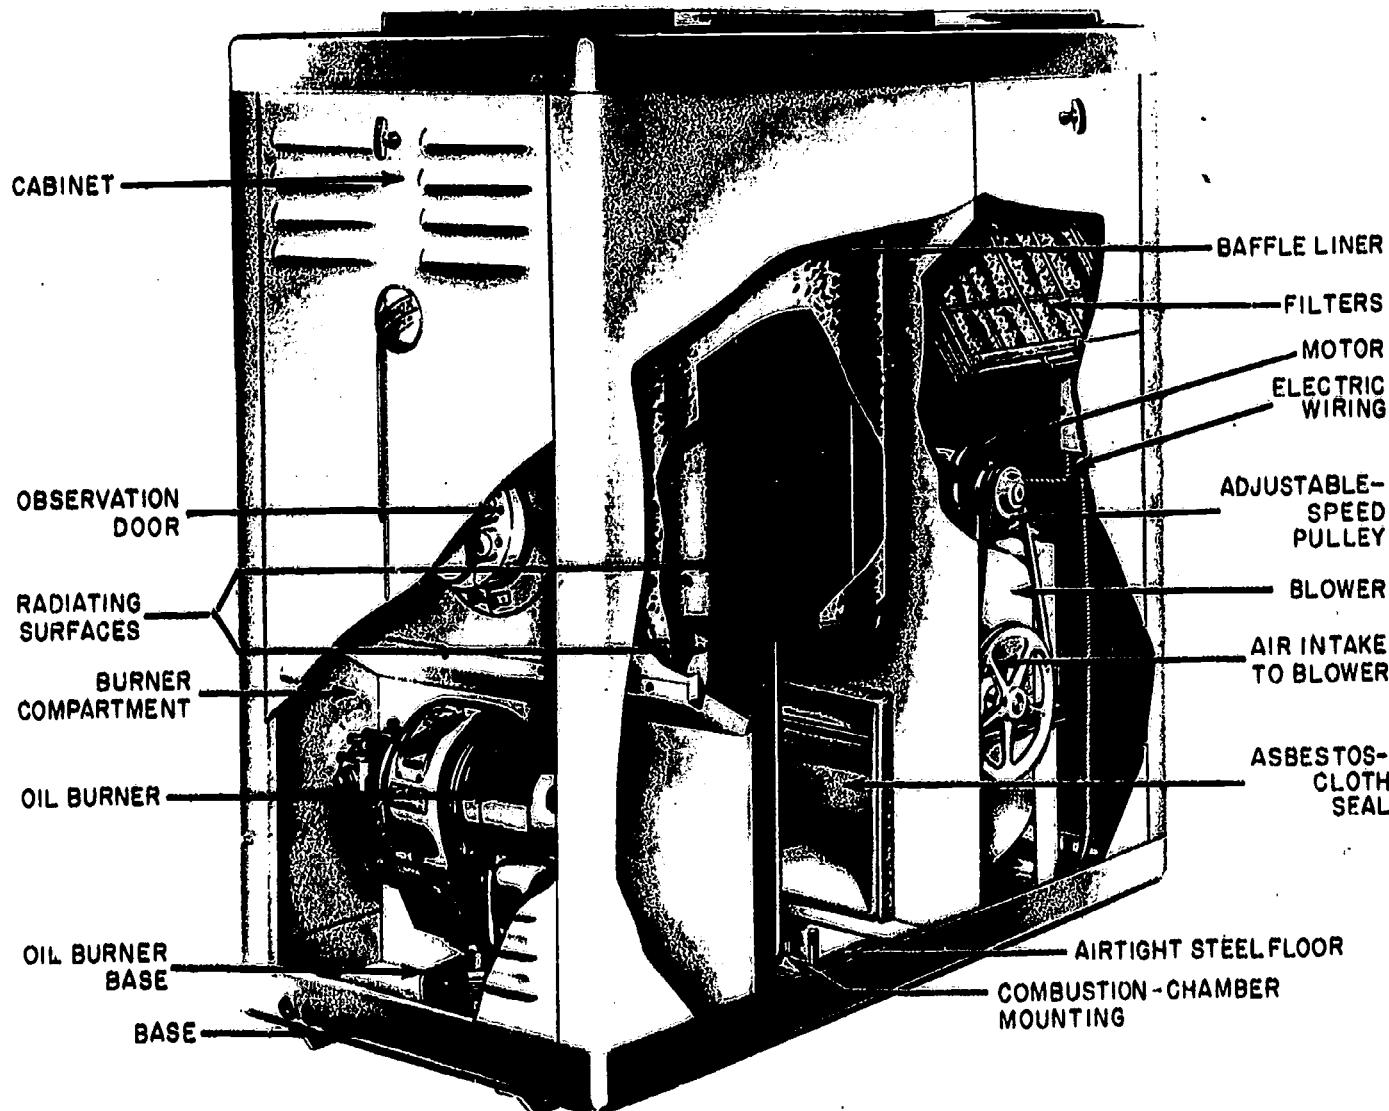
Cutaway view of a typical oil-designed furnace.
